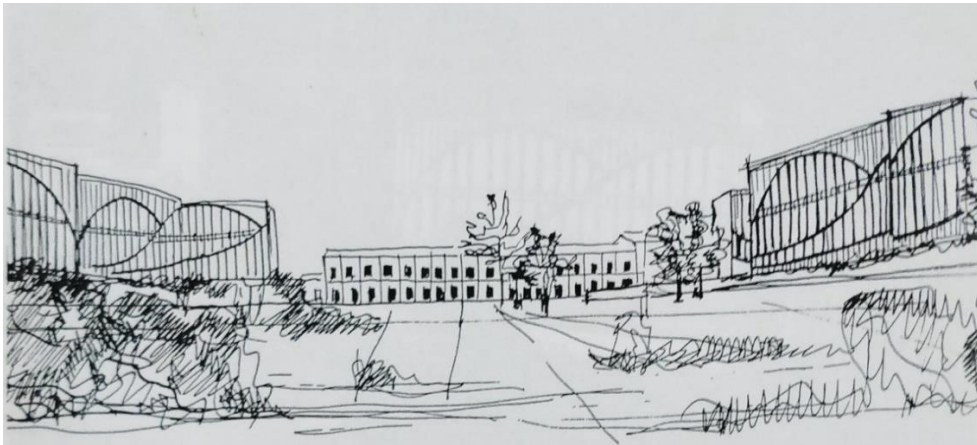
Sketch of the view towards the factory building depicting its relationship with the pre-existing buildings with their new façades.
